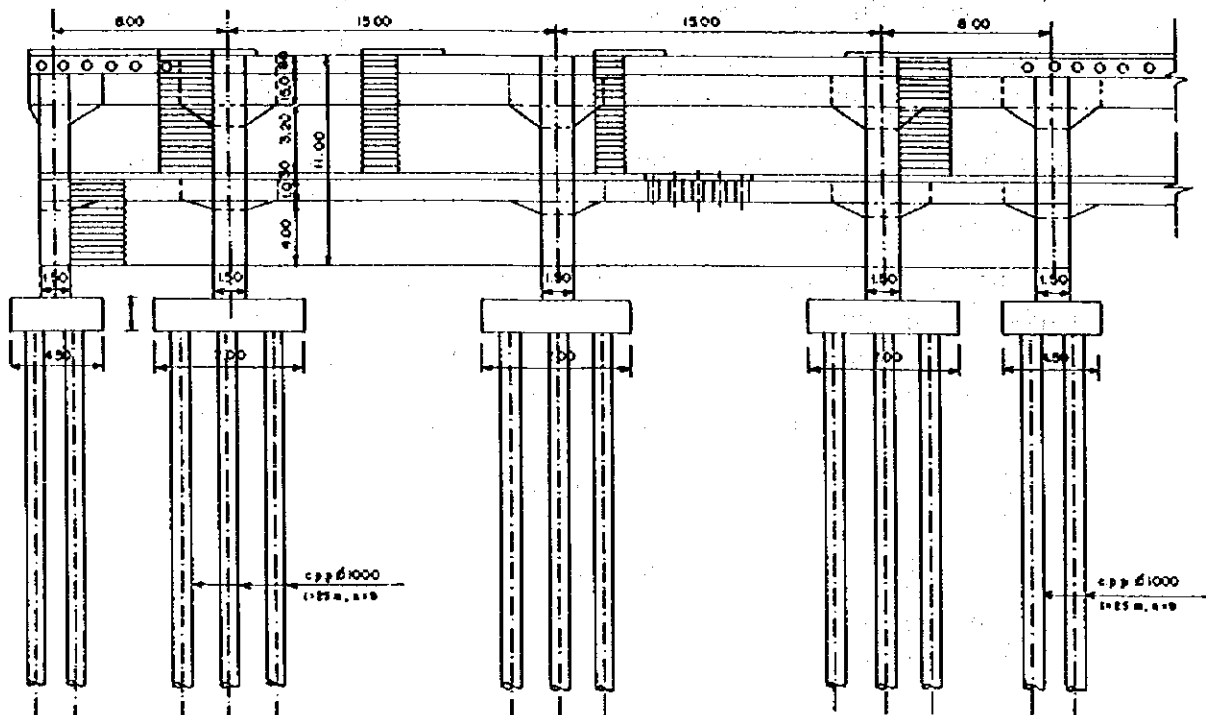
Structural Frame – Central Urban Bus Terminal
